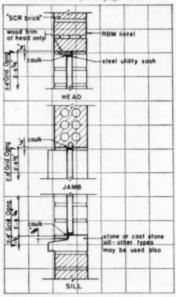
Standard steel "utility" window as it would be installed in an "SCR brick" wall used in a one-story garage
